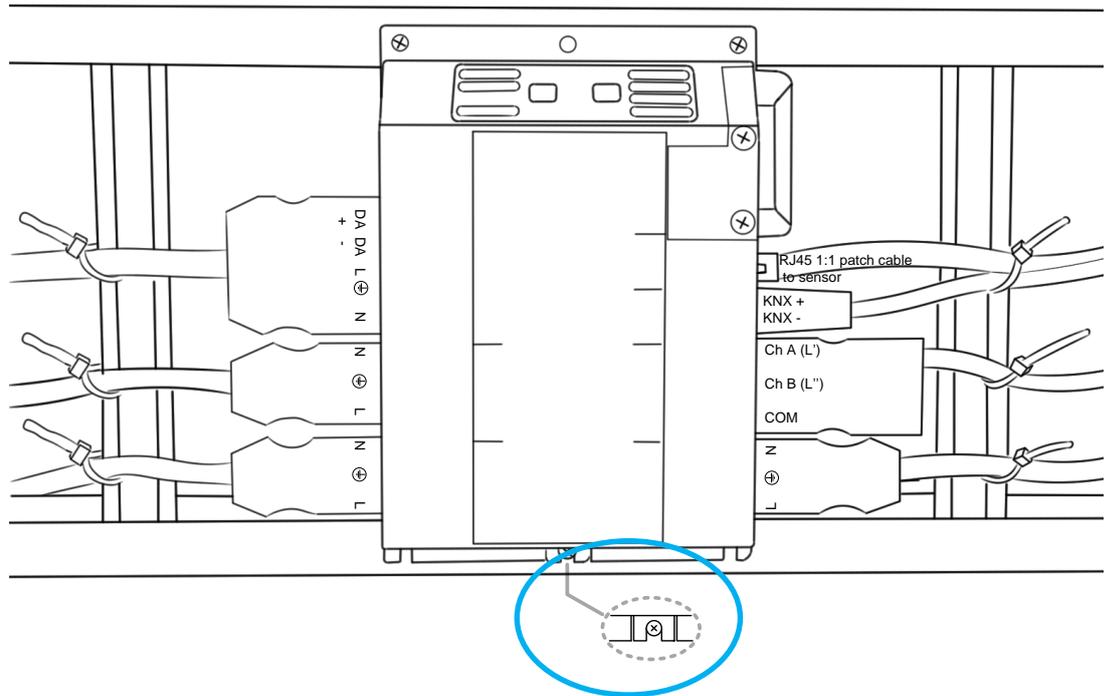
Typical mounting of the MultiController (seen from bottom side)
